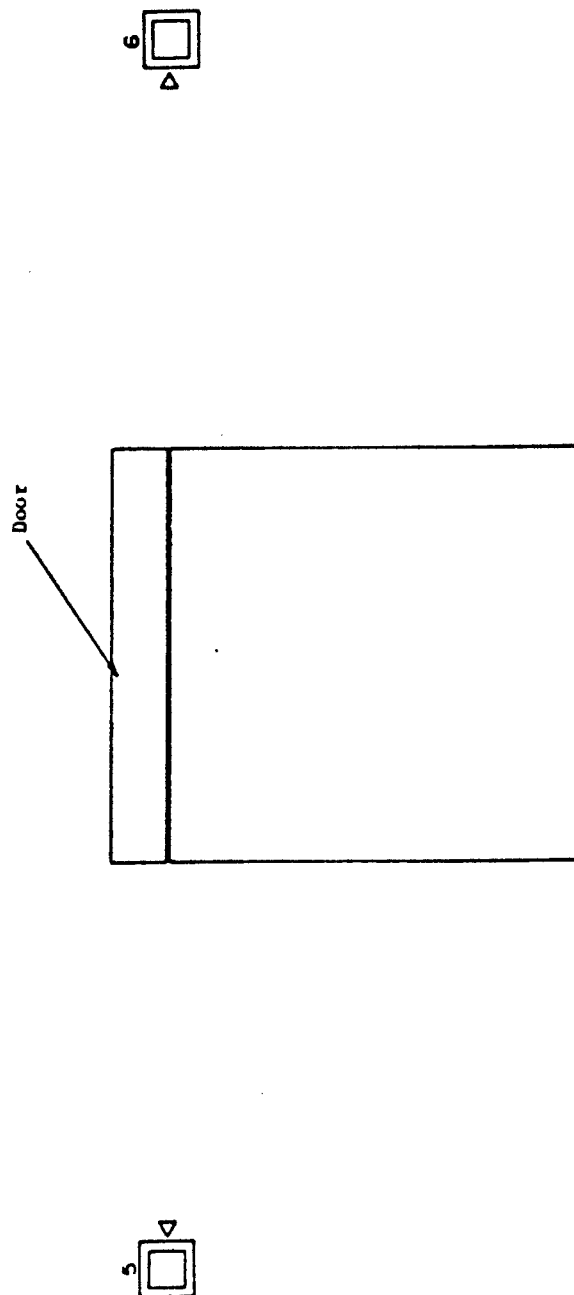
Shelter A Location Of Camera No. 5 and No. 6 Outside
